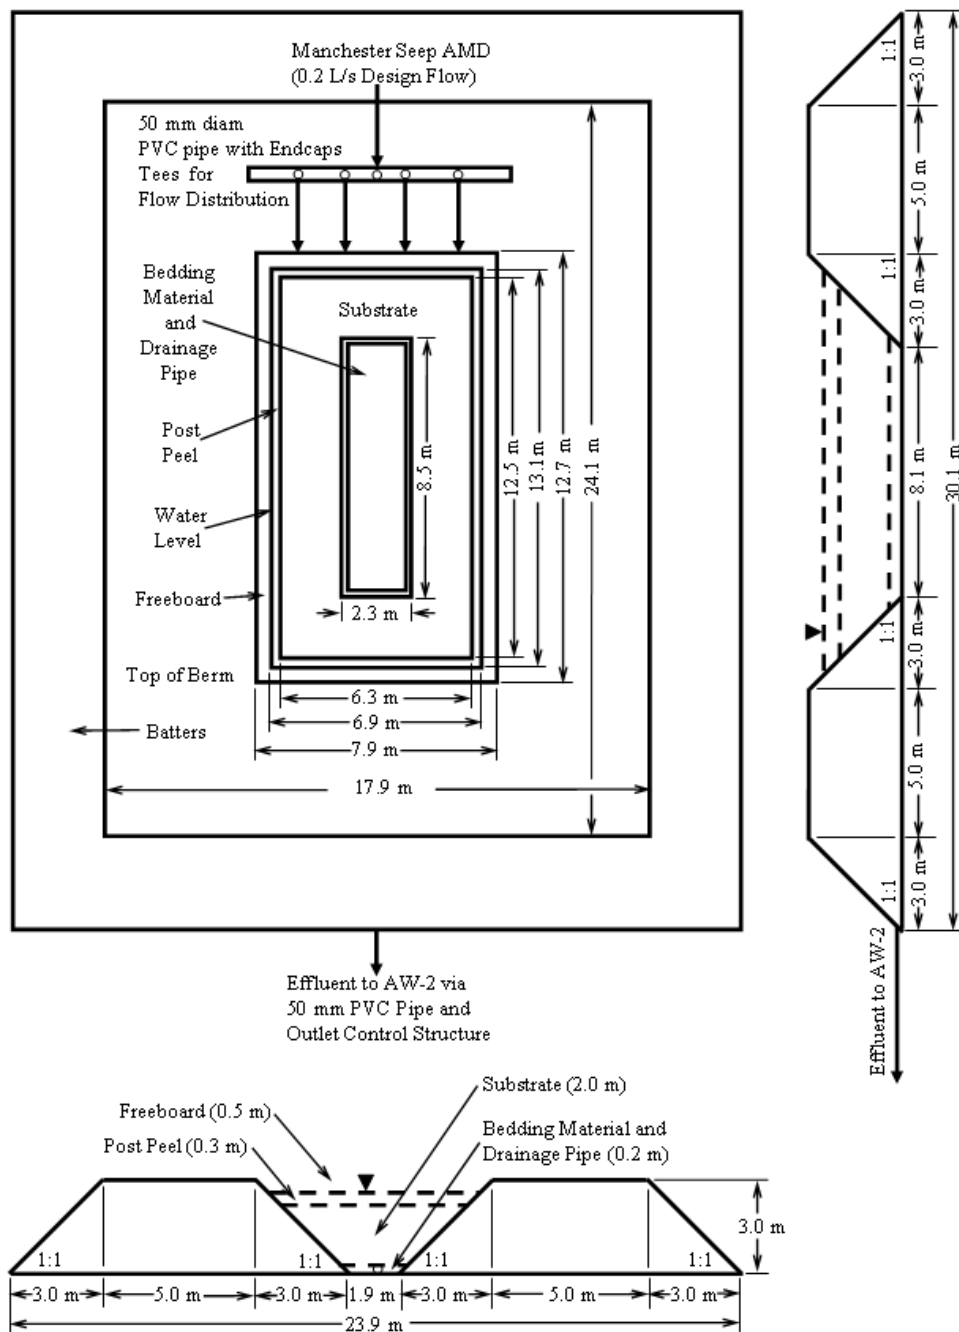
Design dimensions of the pilot-scale BGCR PS-2.
